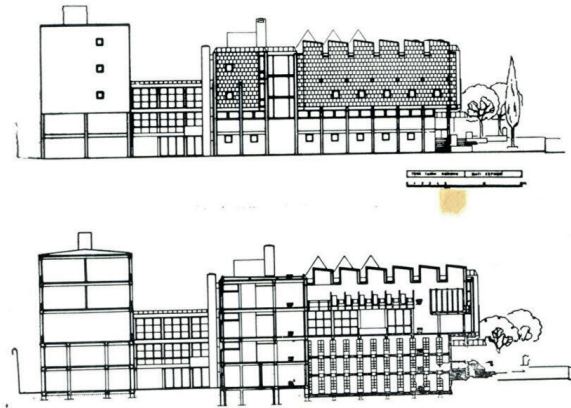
Elevations and sections of the building (Source: Journal of Architecture-Arkitekt)
